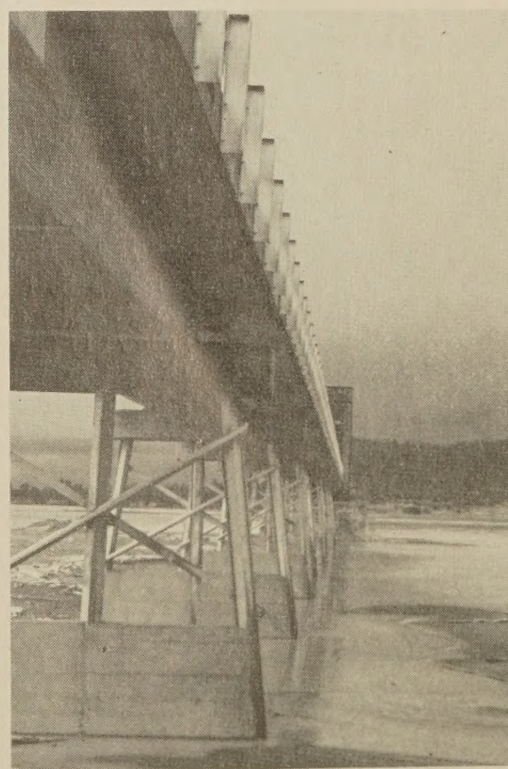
Severe erosion on windward side of I-beam piles on Mile 27 Bridge.
